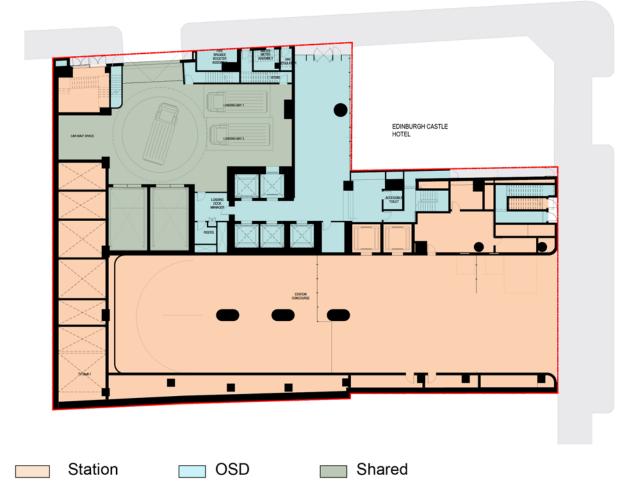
Pitt Street South Potential Ground Floor Use Delineation
